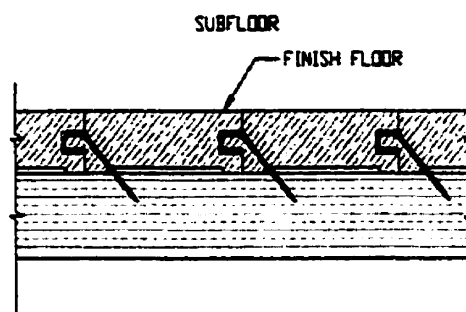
A section showing panels with tongue and groove are blind nailed. (Author)
